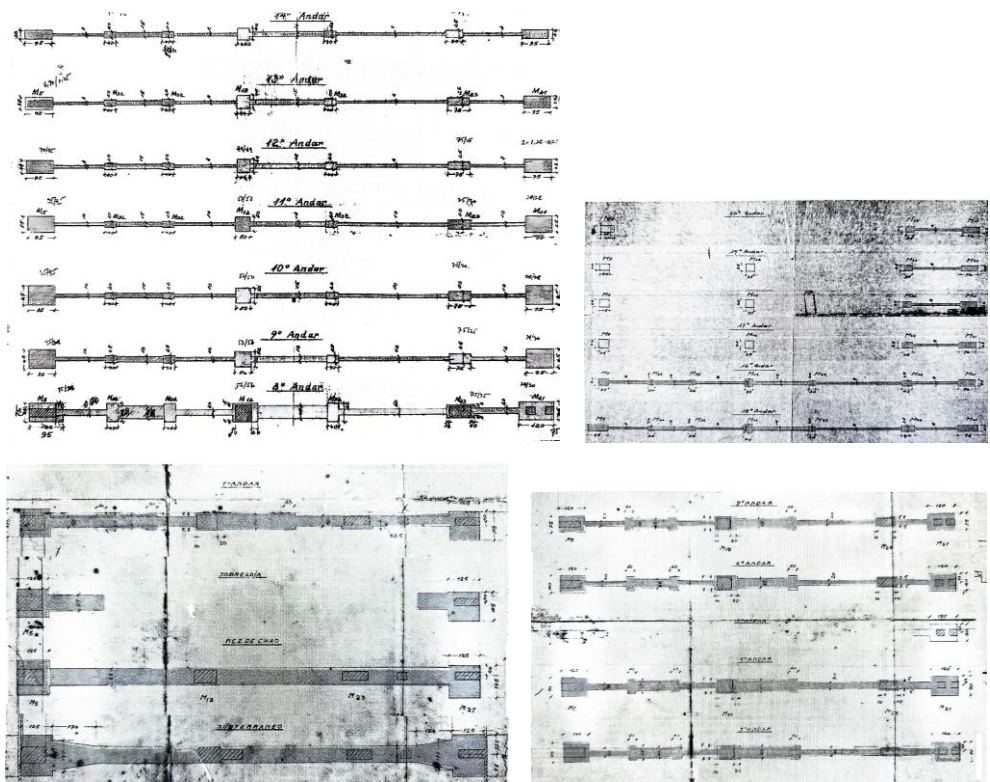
Bracing formwork plans. Top: left, 8th to 14th floors; right, 15th to 20th floors. Bottom: left, basement to 1st floor; right, 2nd to 7th floors. Source: SEECLA Archive in Fonseca (2016) [3].
